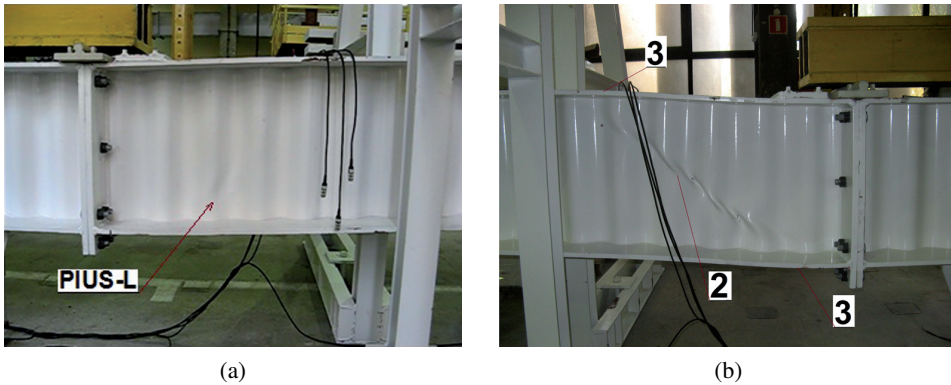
Stages of failure mode of girder with corrugated web M 2.11 (500 × 2.5): a) initiation point of instability (PIUS-L) of the girder web, b) final failure mode of the girder
